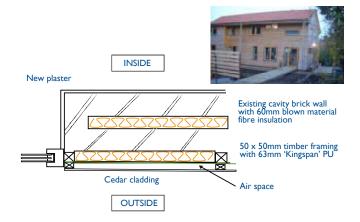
Insulated timber cladding to a cavity wall house. Picture:Tony Clelford.
